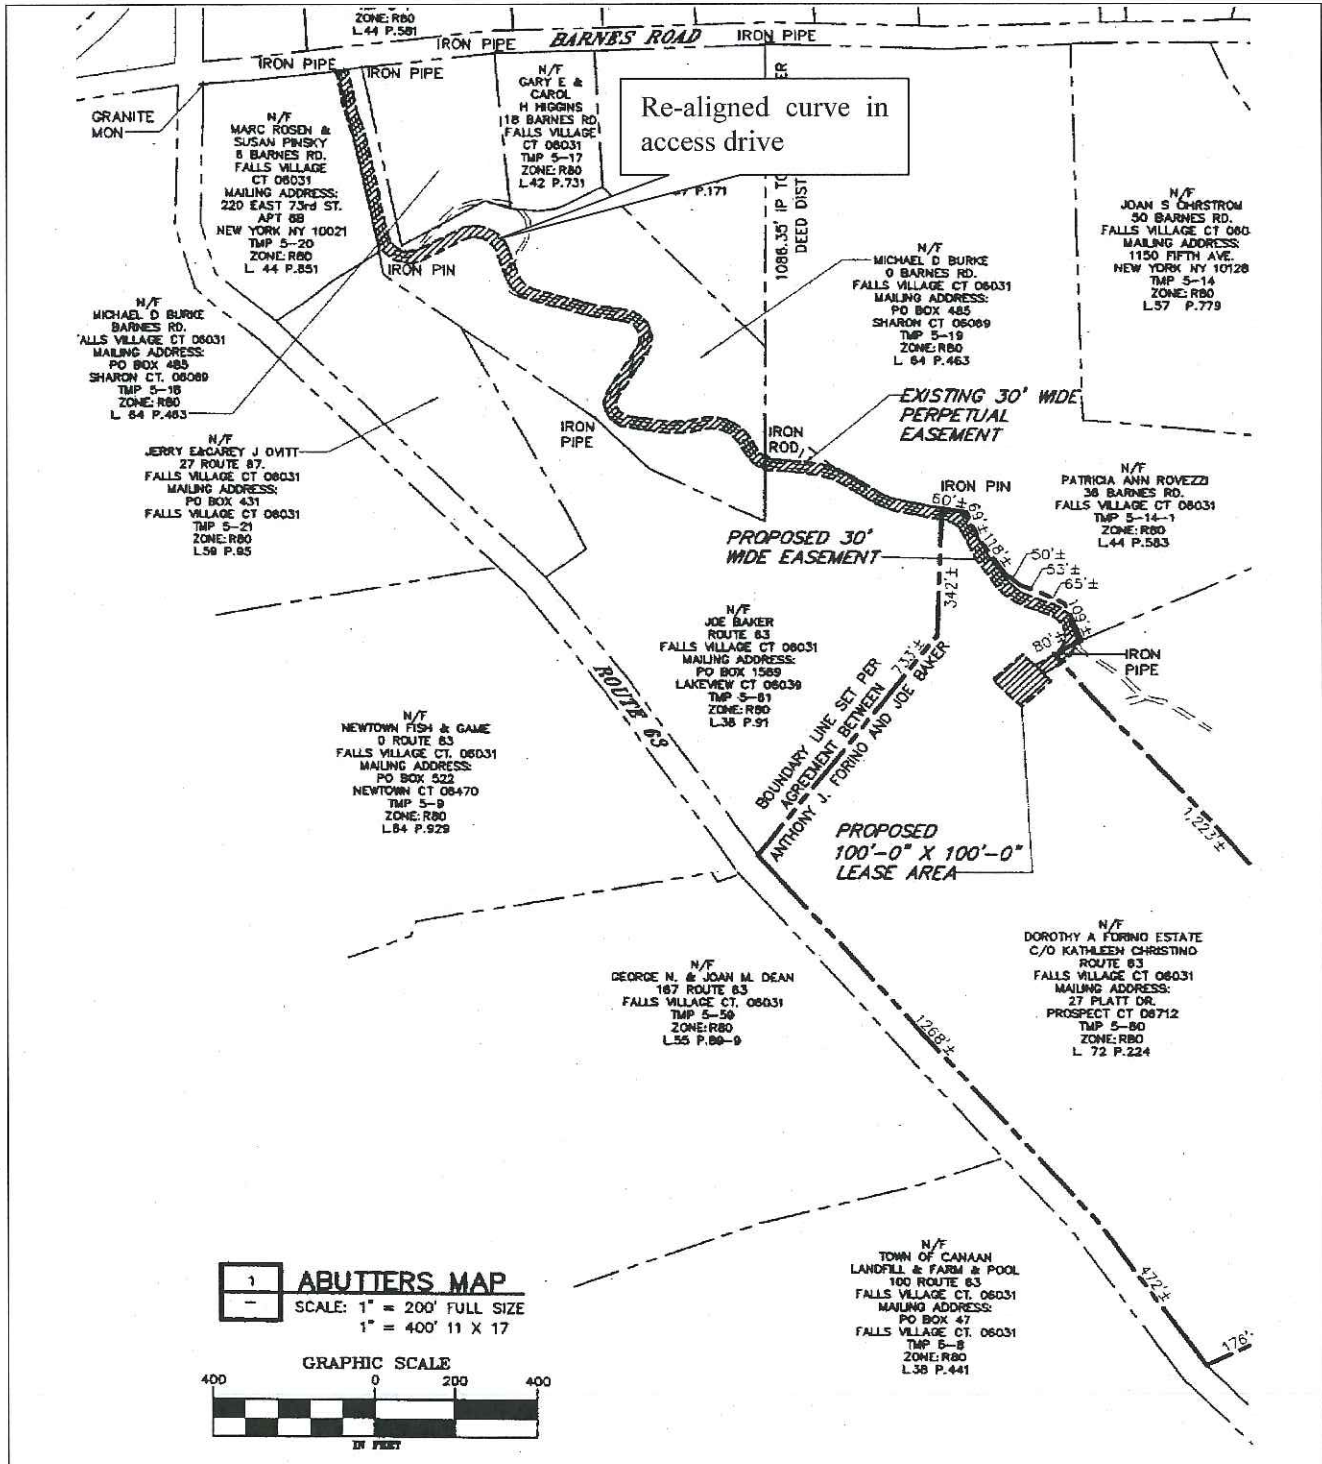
Site access drive and compound location, and abutting properties. (AT&T 1, Tab 3)
